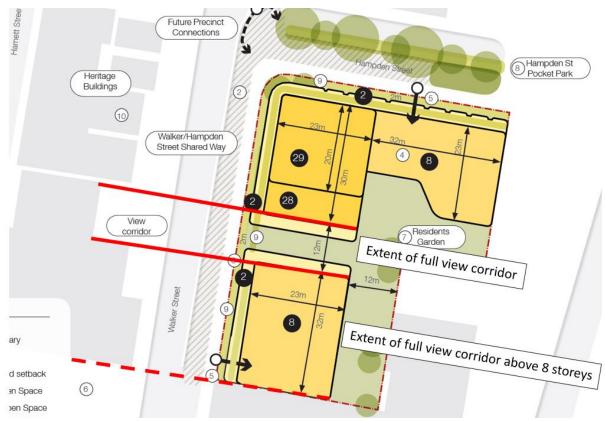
Building envelope plan showing view corridors (Source: Urbis).
